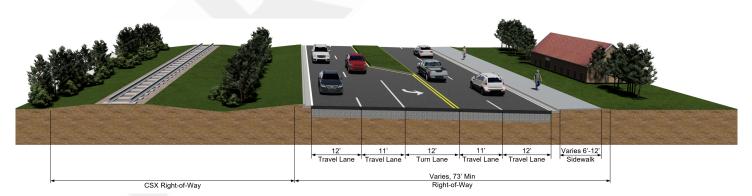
Design Concept Typical Section (US 17/Main Street from New Berlin Road to Airport Center Drive)
